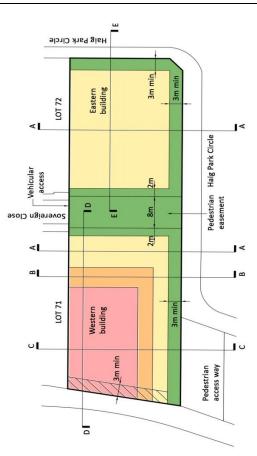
Lot 70 - Building setbacks and building envelope cross section locations.
